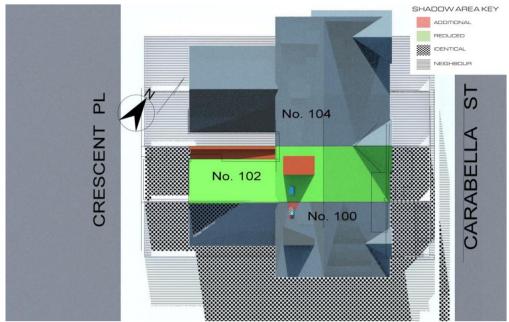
Shadow Diagram at 3.00 pm detailing shadow cast over the roof and skylight of the attached dwelling and roof and skylight of 100 Carabella Street (SD 08 Rev 01)
